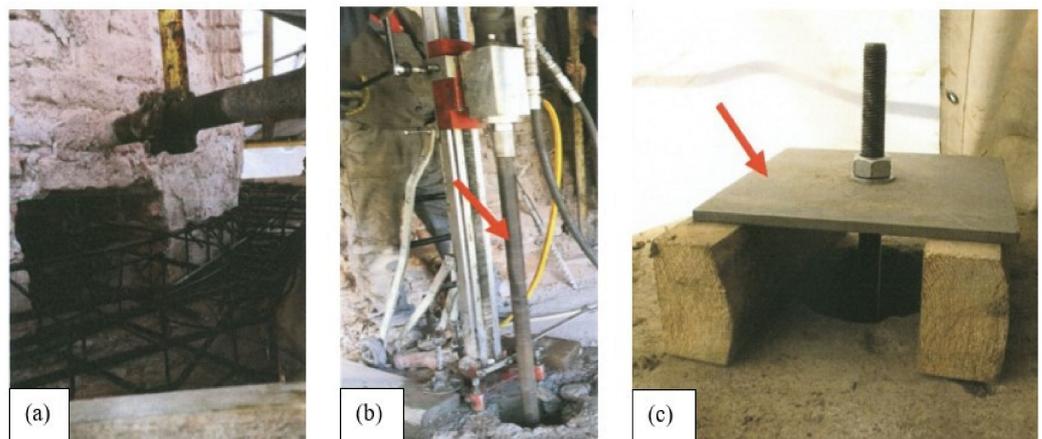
Vertical steel rods. Stages of installation: (a) Reinforced concrete girders, (b) Drilling of galleries, (c) Insertion and fixing of the steel rod.
